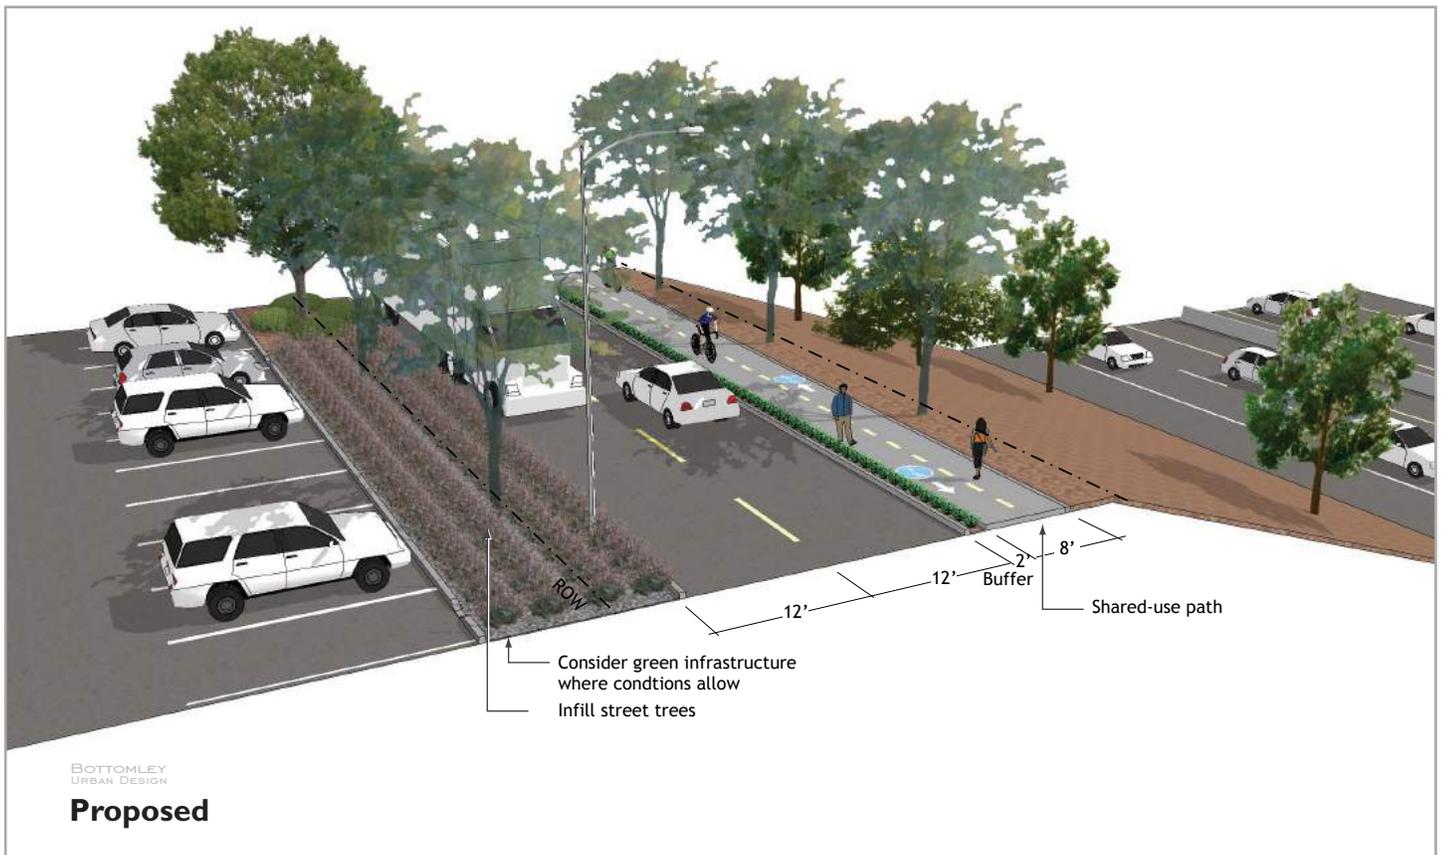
INDUSTRIAL WAY (PARK ROAD TO TEAL DRIVE) – SHARED-USE PATH
